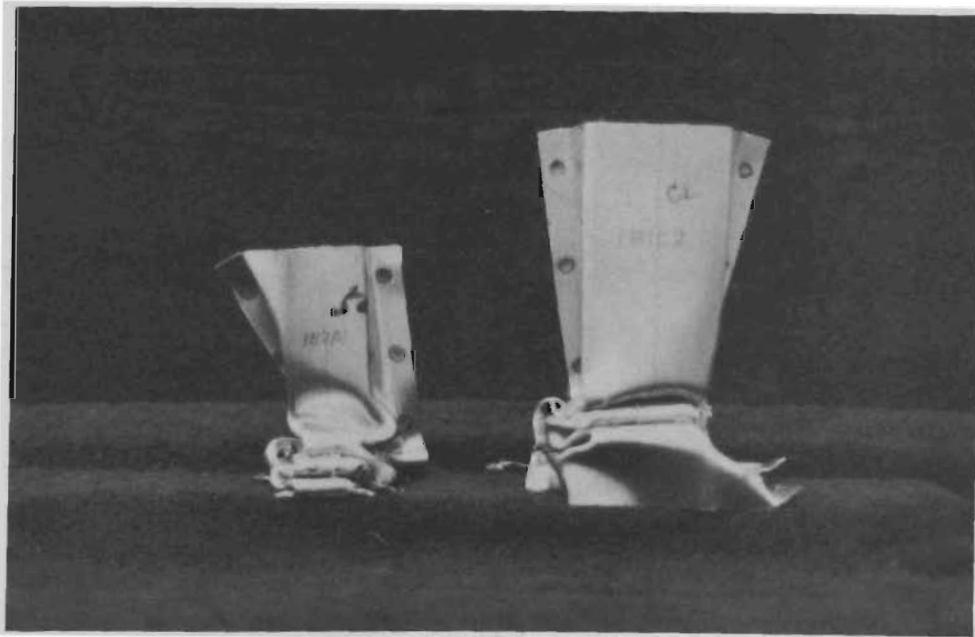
Typical Lateral Buckling Type of Stub Column Specimens
